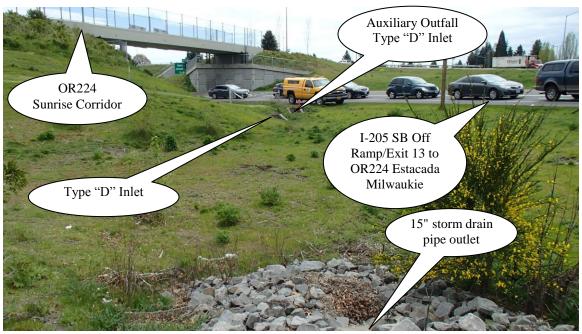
a view of bio-retention pond, looking South toward I-205 off ramp.
